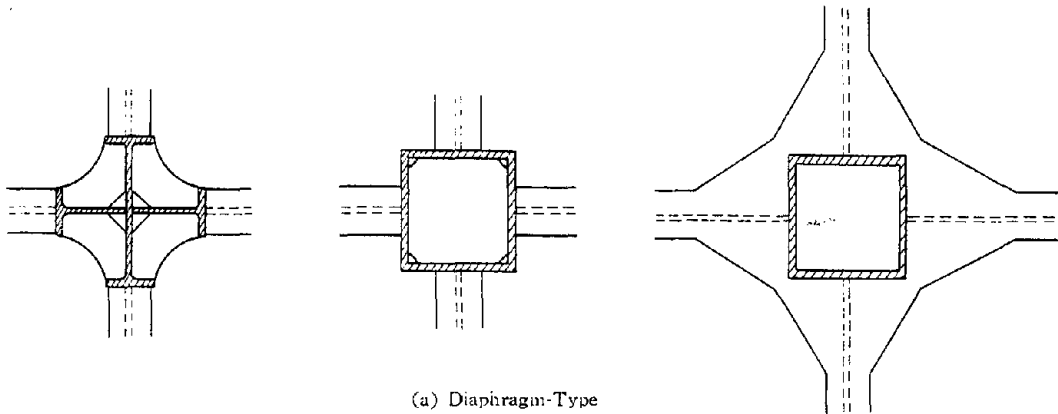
Steel beam-column connection details [AIJ, 1970]
